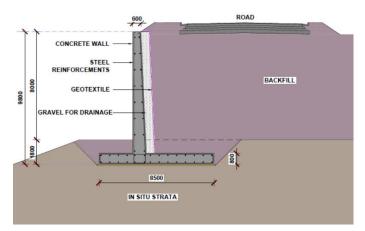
Case A: Reinforced Concrete Wall (RCC)
